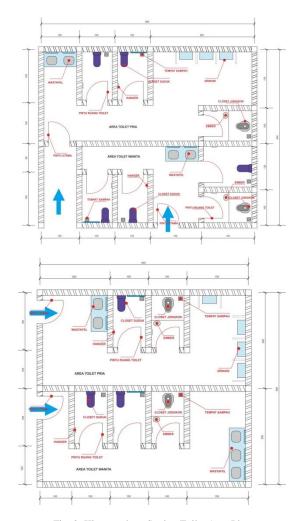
Kiaracondong Station Toilet Area Plan (Source: PT KAI DAOP 2 Bandung)
